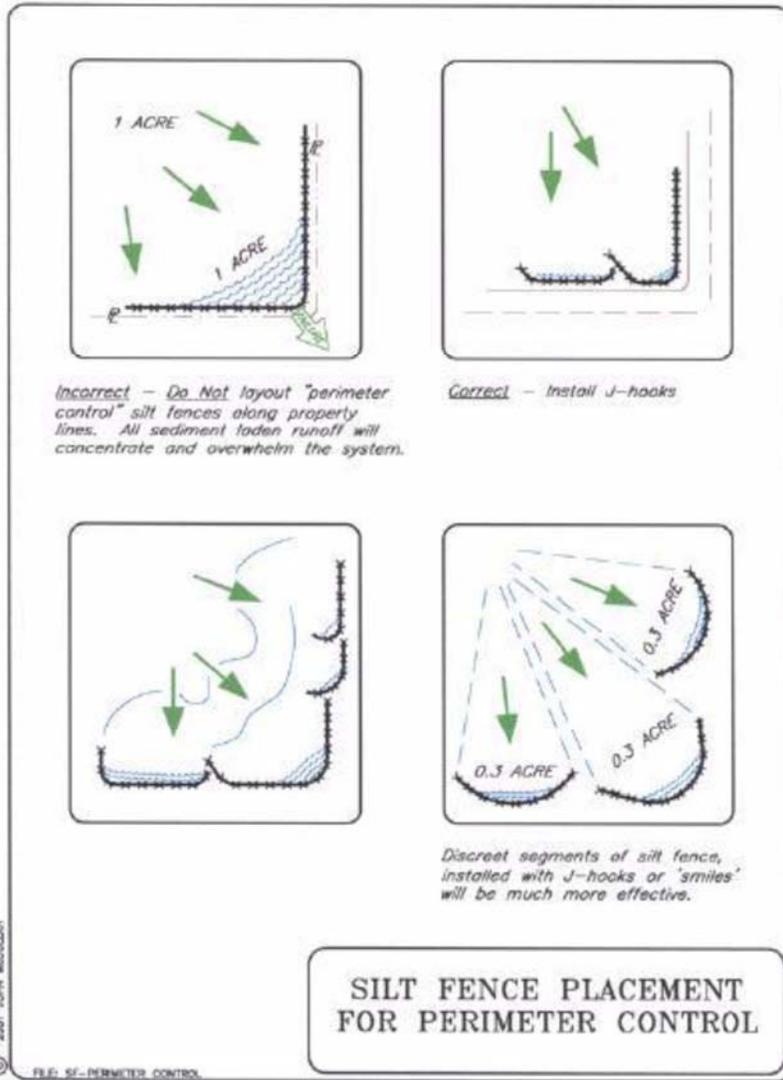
G.4 Silt Fence J - Hook Detail
